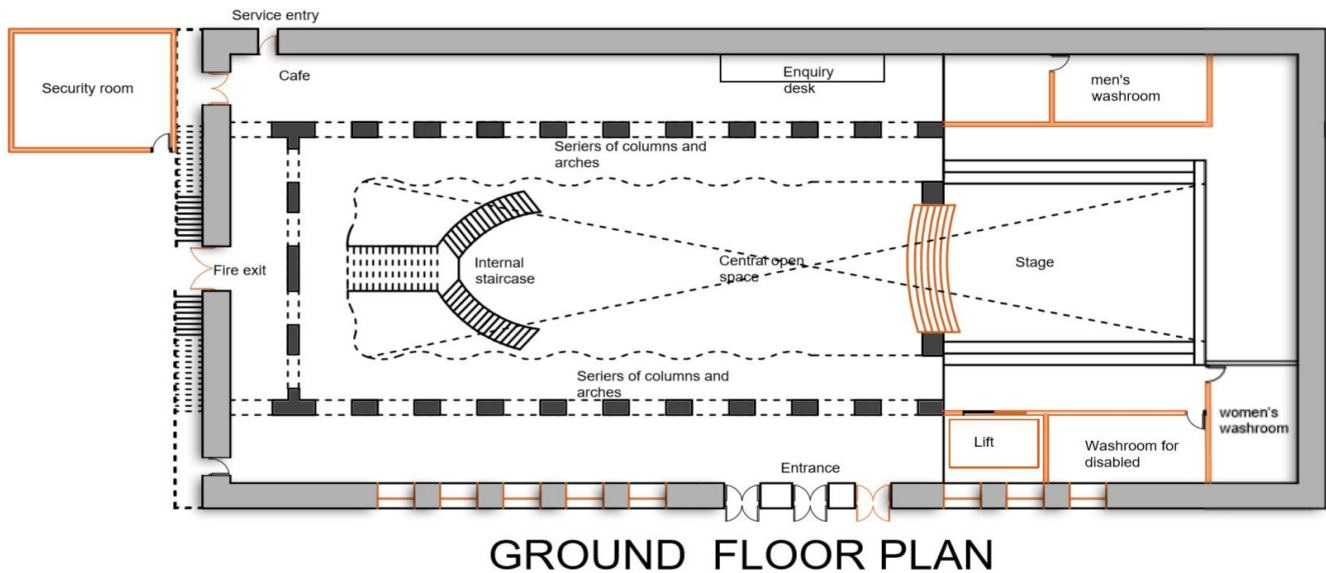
Ground floor plan of opera house after adaptive reuse -- Source: Author
